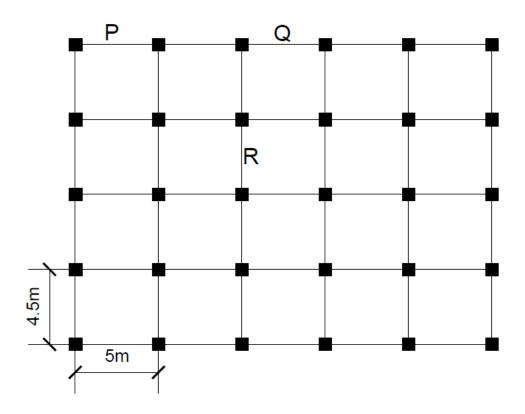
Location of selected beams P, Q & R in the plan of the building
